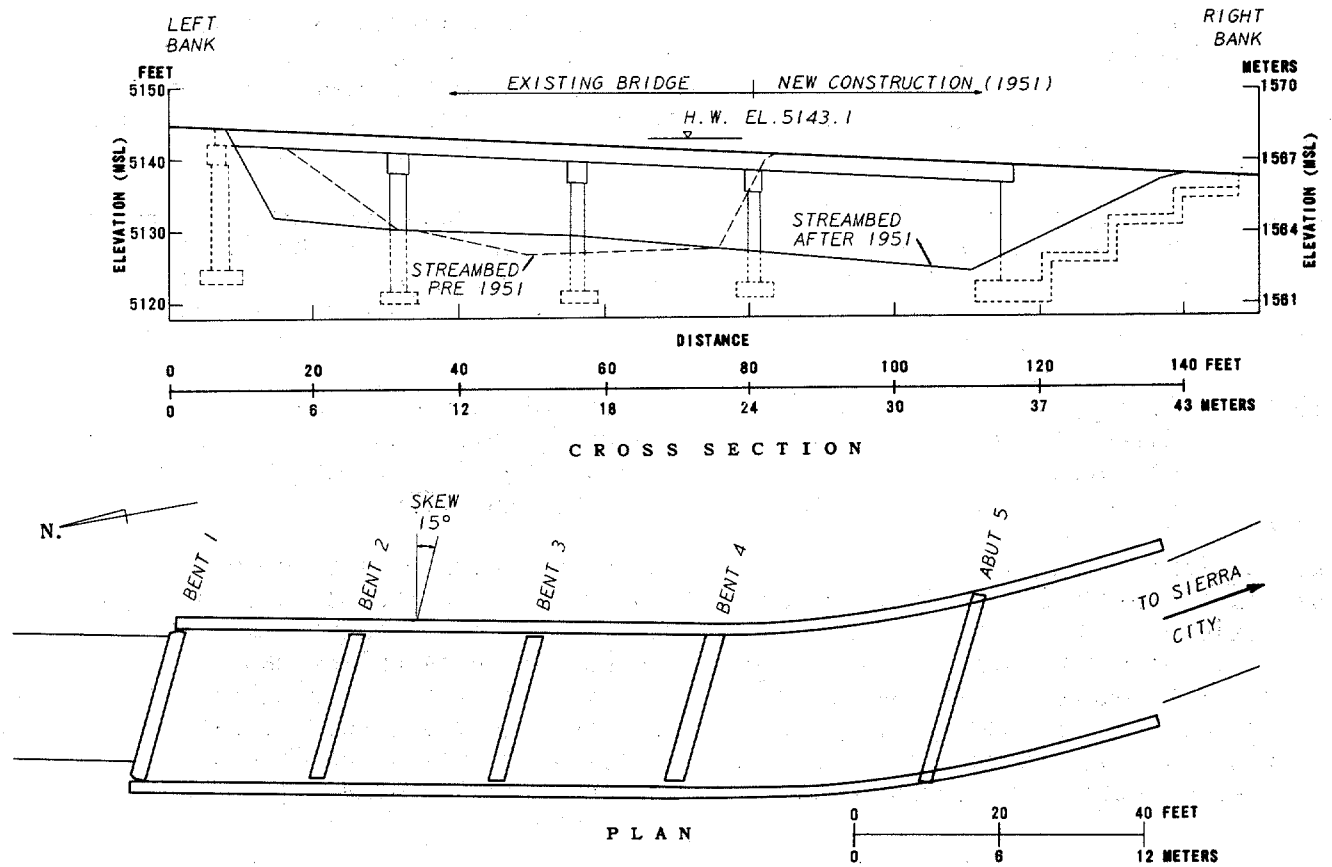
Plan and cross section of Salmon Creek bridge, built in 1925 and extended in 1951.
